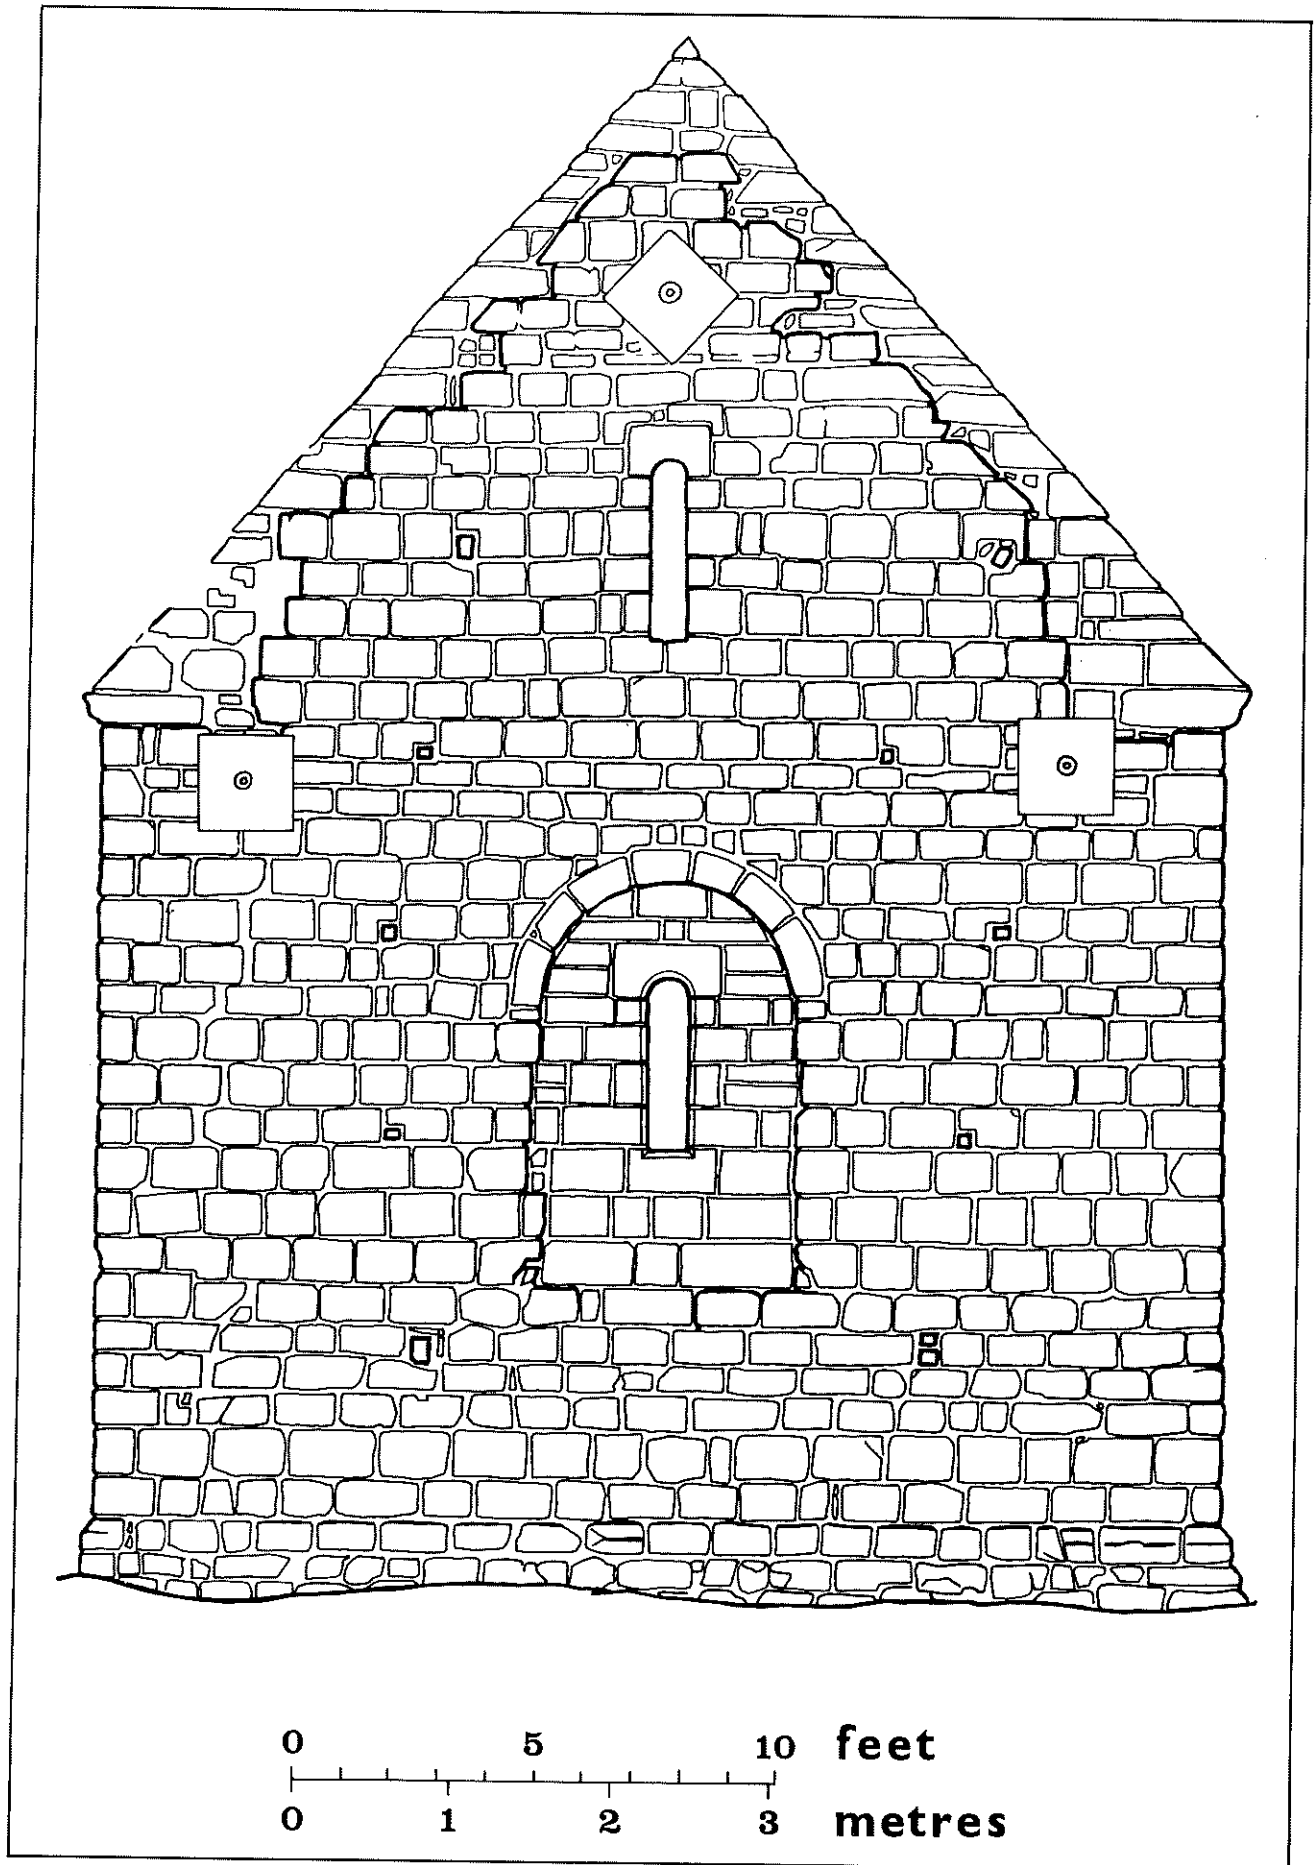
THE EXTERNAL ELEVATION OF THE EAST WALL OF THE CHANCEL
